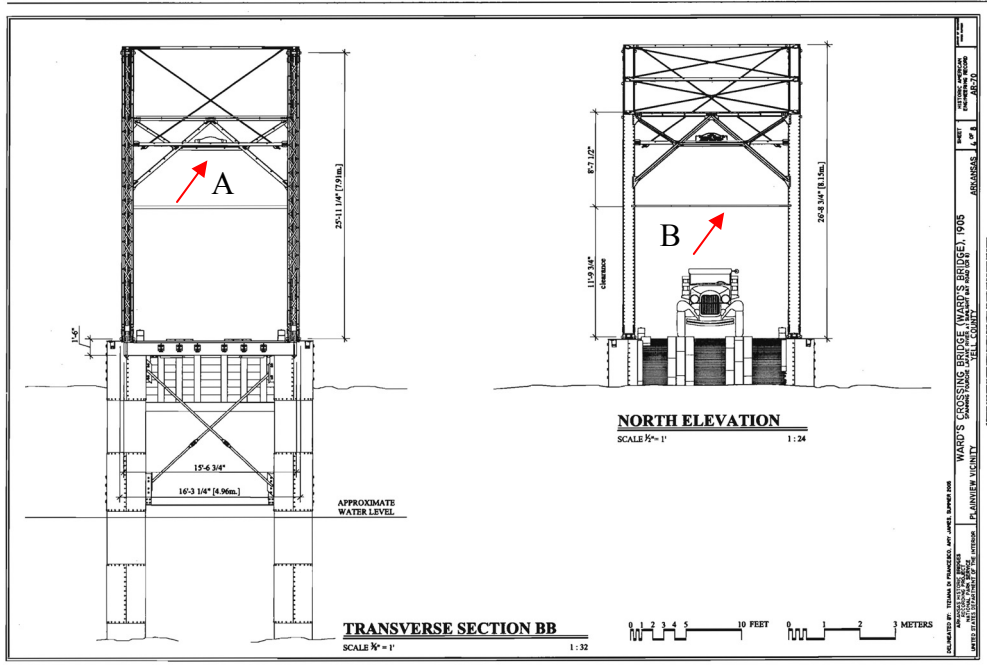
Transverse Section from 2005 NPS HAER Ward’s Crossing Bridge drawings.
